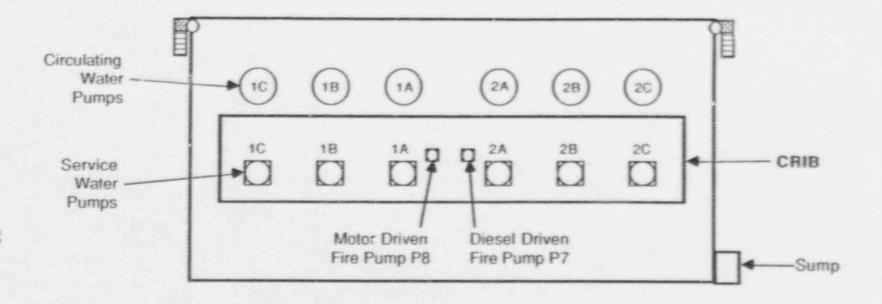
Zion 1 and 2 General Arrangement, Crib House
